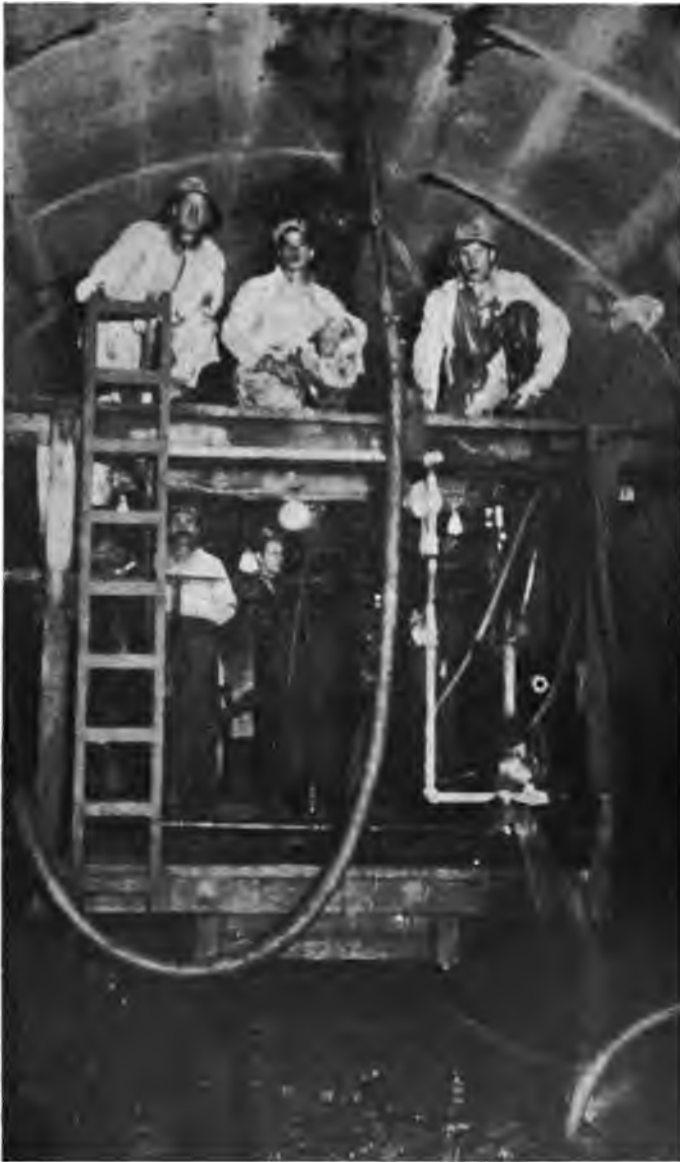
Contract 12. Grouting Outfit as Used in Rondout Tunnel. Worthington High-stage Compressor (350 lbs.) and Caniff Grouting Machine Mounted on Movable Platform. Valve on grout pipe is operated by men on platform. Grouting was mostly done by direct air pressures of 40 to 100 lbs. per square inch. Remainder with high air up to 350 lbs. per square inch.
